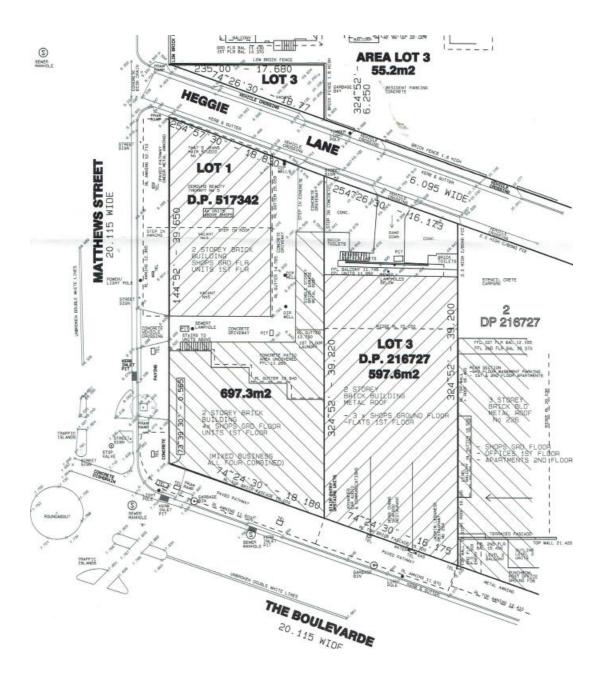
Survey Extract of subject site (Source: Precision Site Surveys, 2022)
